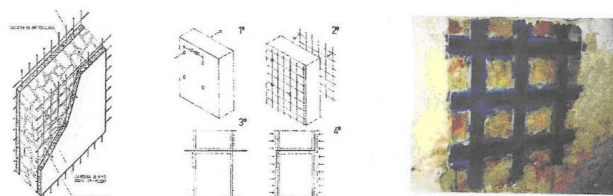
Increase the shear strength: a) b) Wall and pier jacketing, c) Wall and pier jacketing with FRP strips.
